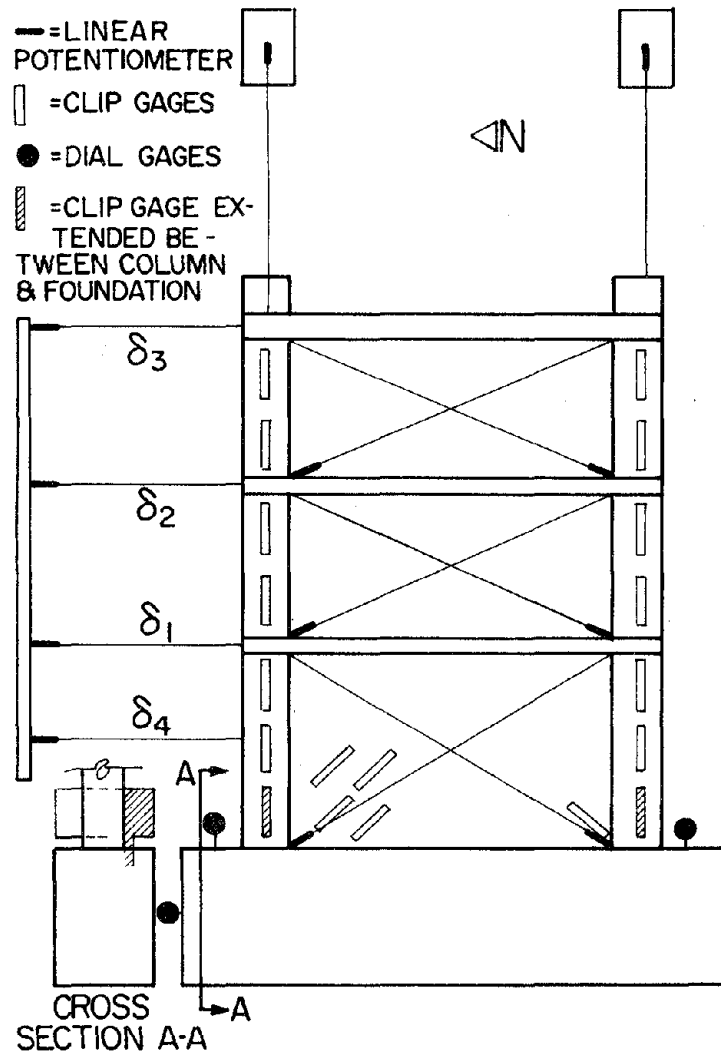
EXTERNAL INSTRUMENTATION OF WALL SPECIMEN
